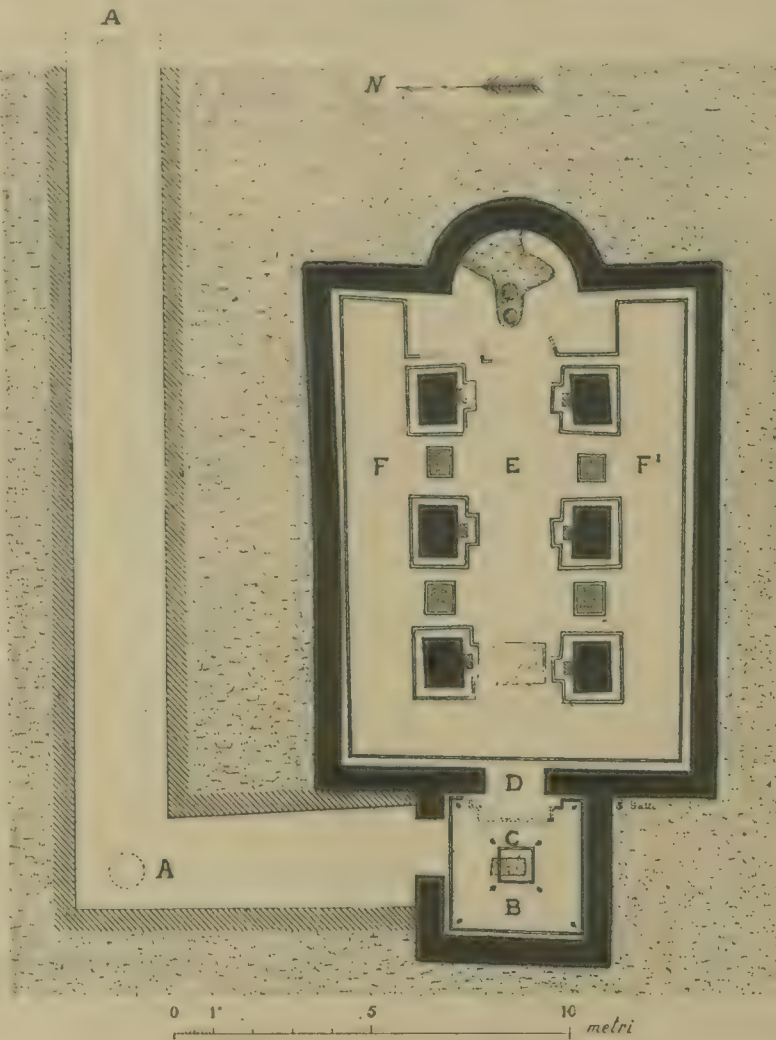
THE MYSTERIOUS SECRET LODGE FOUND UNDER A RAILWAY-EMBANKMENT OUTSIDE THE PORTA MAGGIORE: A PLAN.
